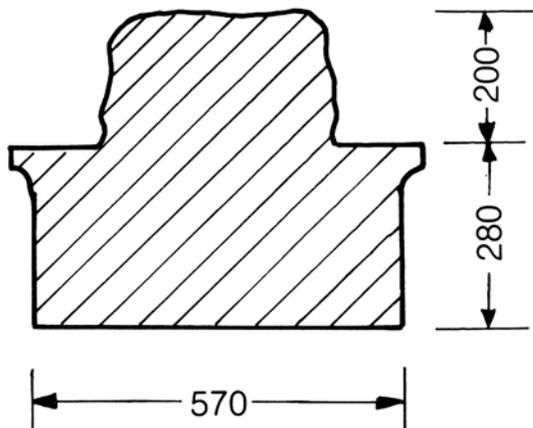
Roof beam with strengthening rib. Not known if on purpose or simply to minimize work to dress the stone. (Kamminga and Cotterell)
